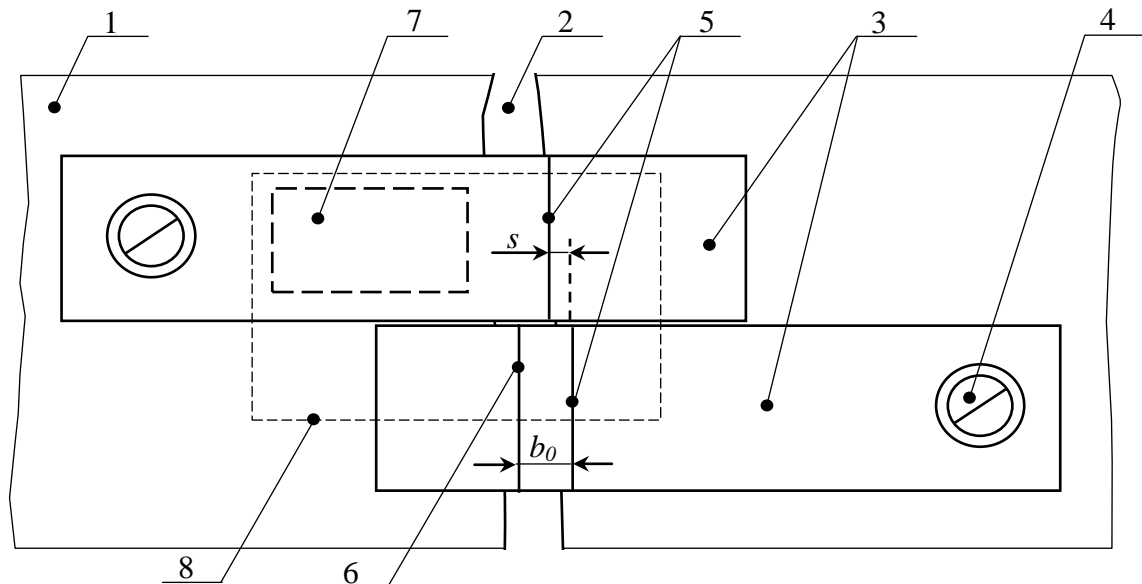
Construction of the bladed beacon: 1 – roof, 2 – fracture, 4 – plate, 4 – rock bolt, 5 – sighting line, 6 – basic line, 7 – place for designation of beacon number, 8 – frame boundary when shooting
